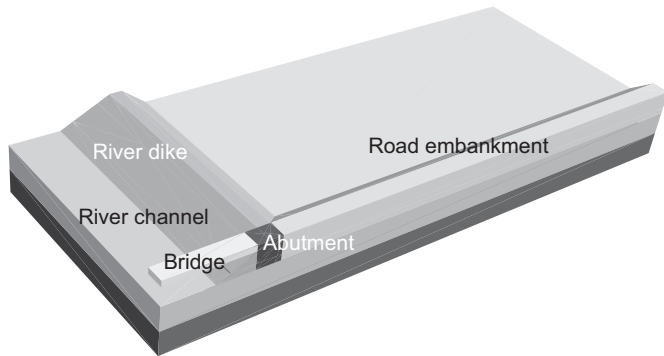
Bird's eye view of abutment for river crossing bridge.
